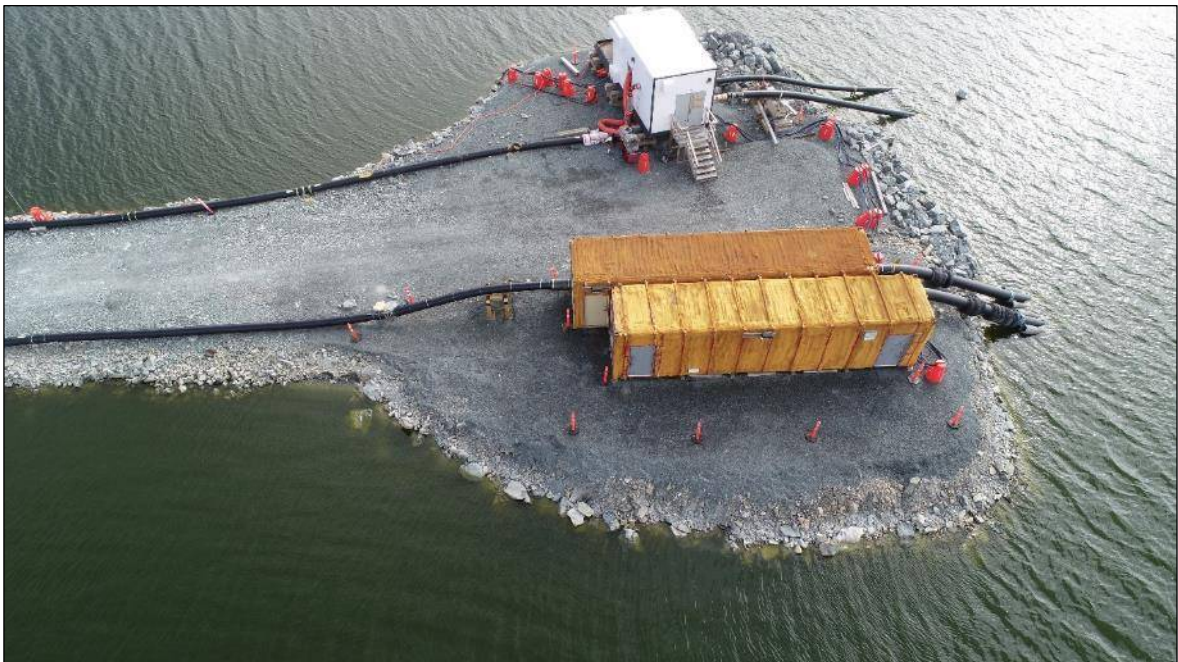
Showing the Reclaim Jetty where the new pump house and electrical room is location (orange insulation).
